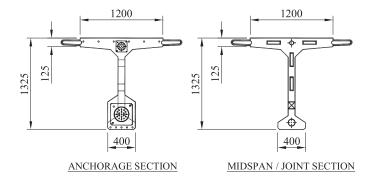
Typical cross-sectional details of a segmental UHPC T-bridge girder
